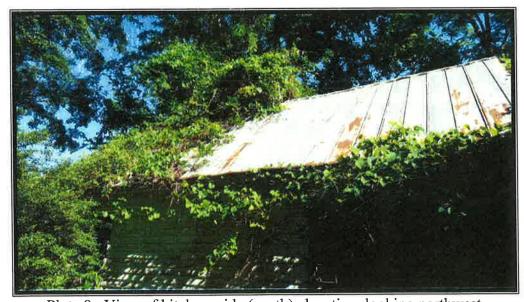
View of kitchen, side (south) elevation, looking northwest.
